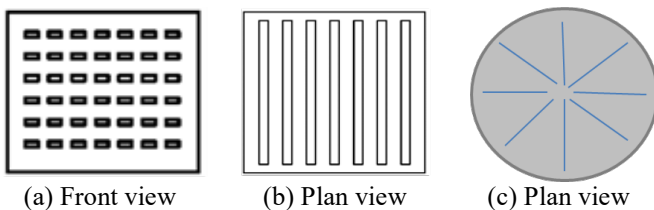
Geometric layout of PET strips for cube and cylindrical specimens
